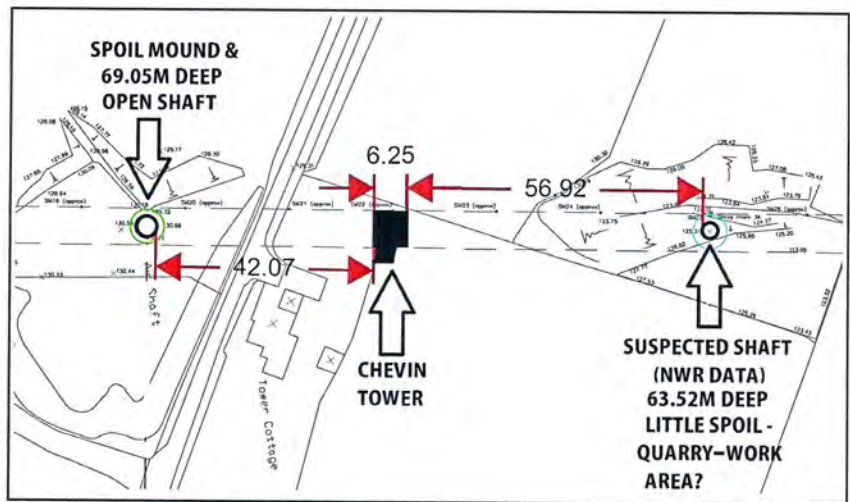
Plan view of shafts in relation to Chevin Tower and tunnel alignment.
